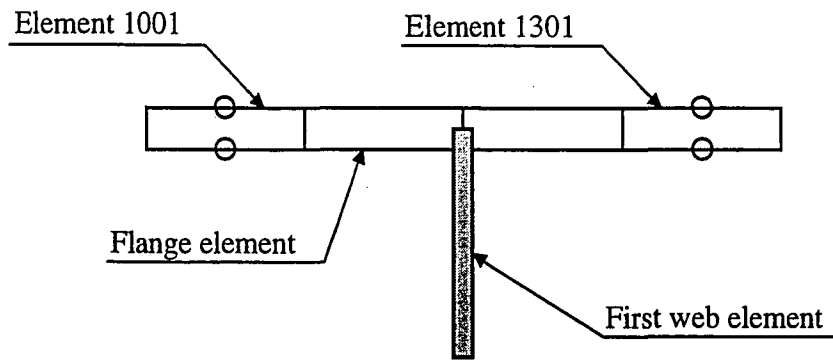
Location of elements adjacent to midspan of 33.5 m span girder
